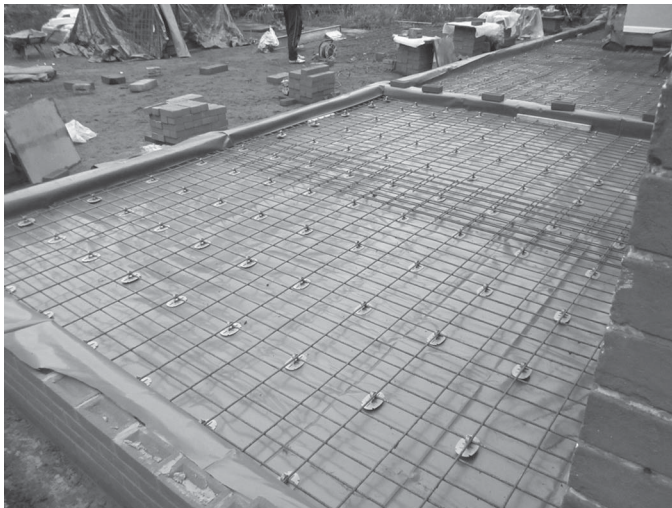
Spacers for welded steel fabric with new soft substrate spacers
